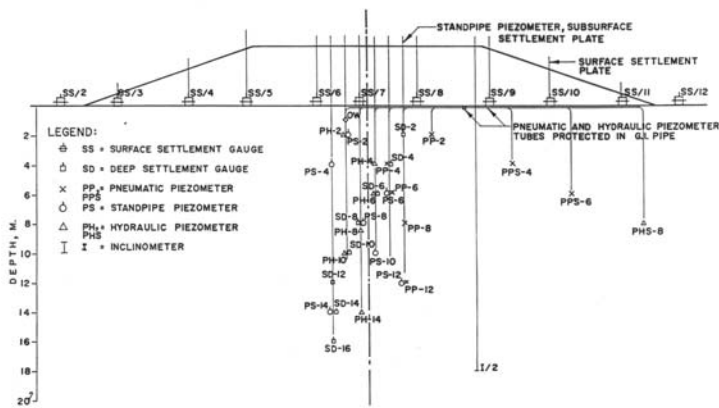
(a) Section view of the test embankment showing the position of instruments at the Second Bangkok International Airport (SBIA).
